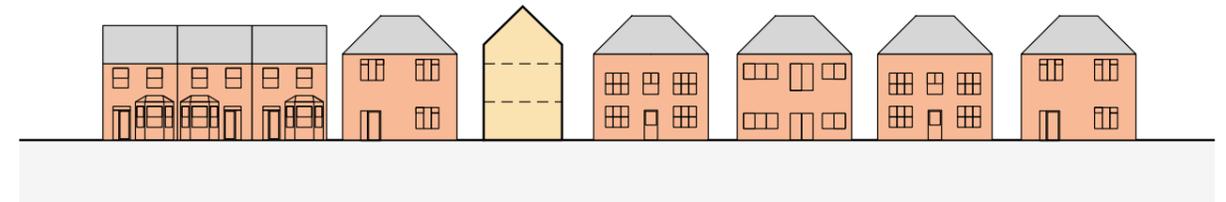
Where existing building heights are broadly consistent along a street, new infill development should not be significantly taller than the buildings either side of them.
